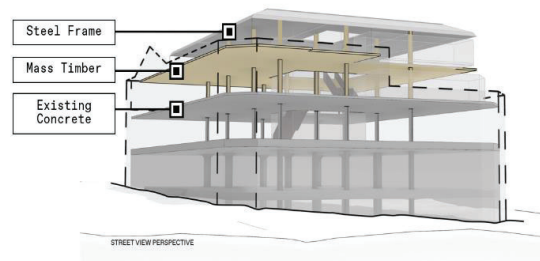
Design strategy and primary structural materials. Outline indicates the façade zone
